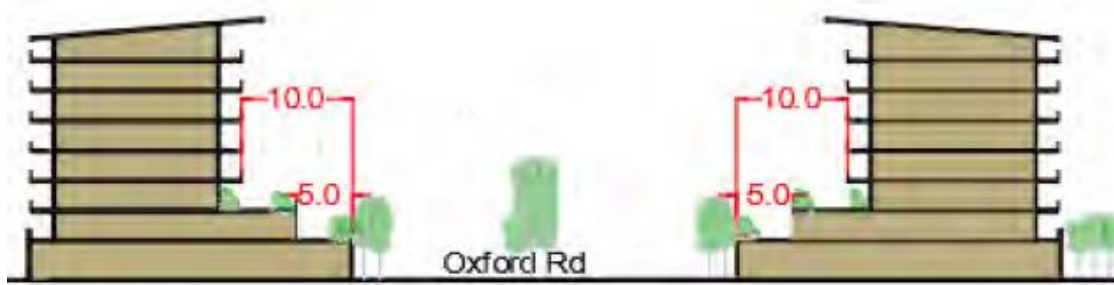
Proposed setbacks for buildings fronting Oxford Road.
